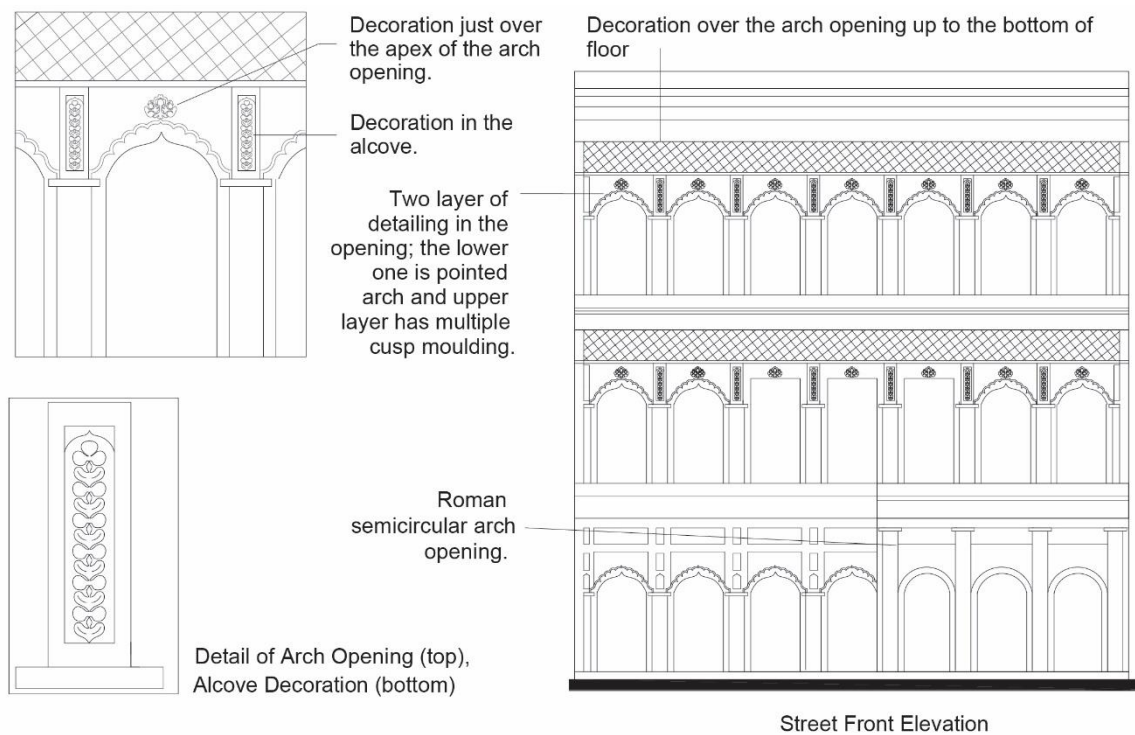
The Hybrid or Mixed use of Mughal and Colonial architectural elements, here Building number 09 is illustrated, (Source - Shaikh 2009)
